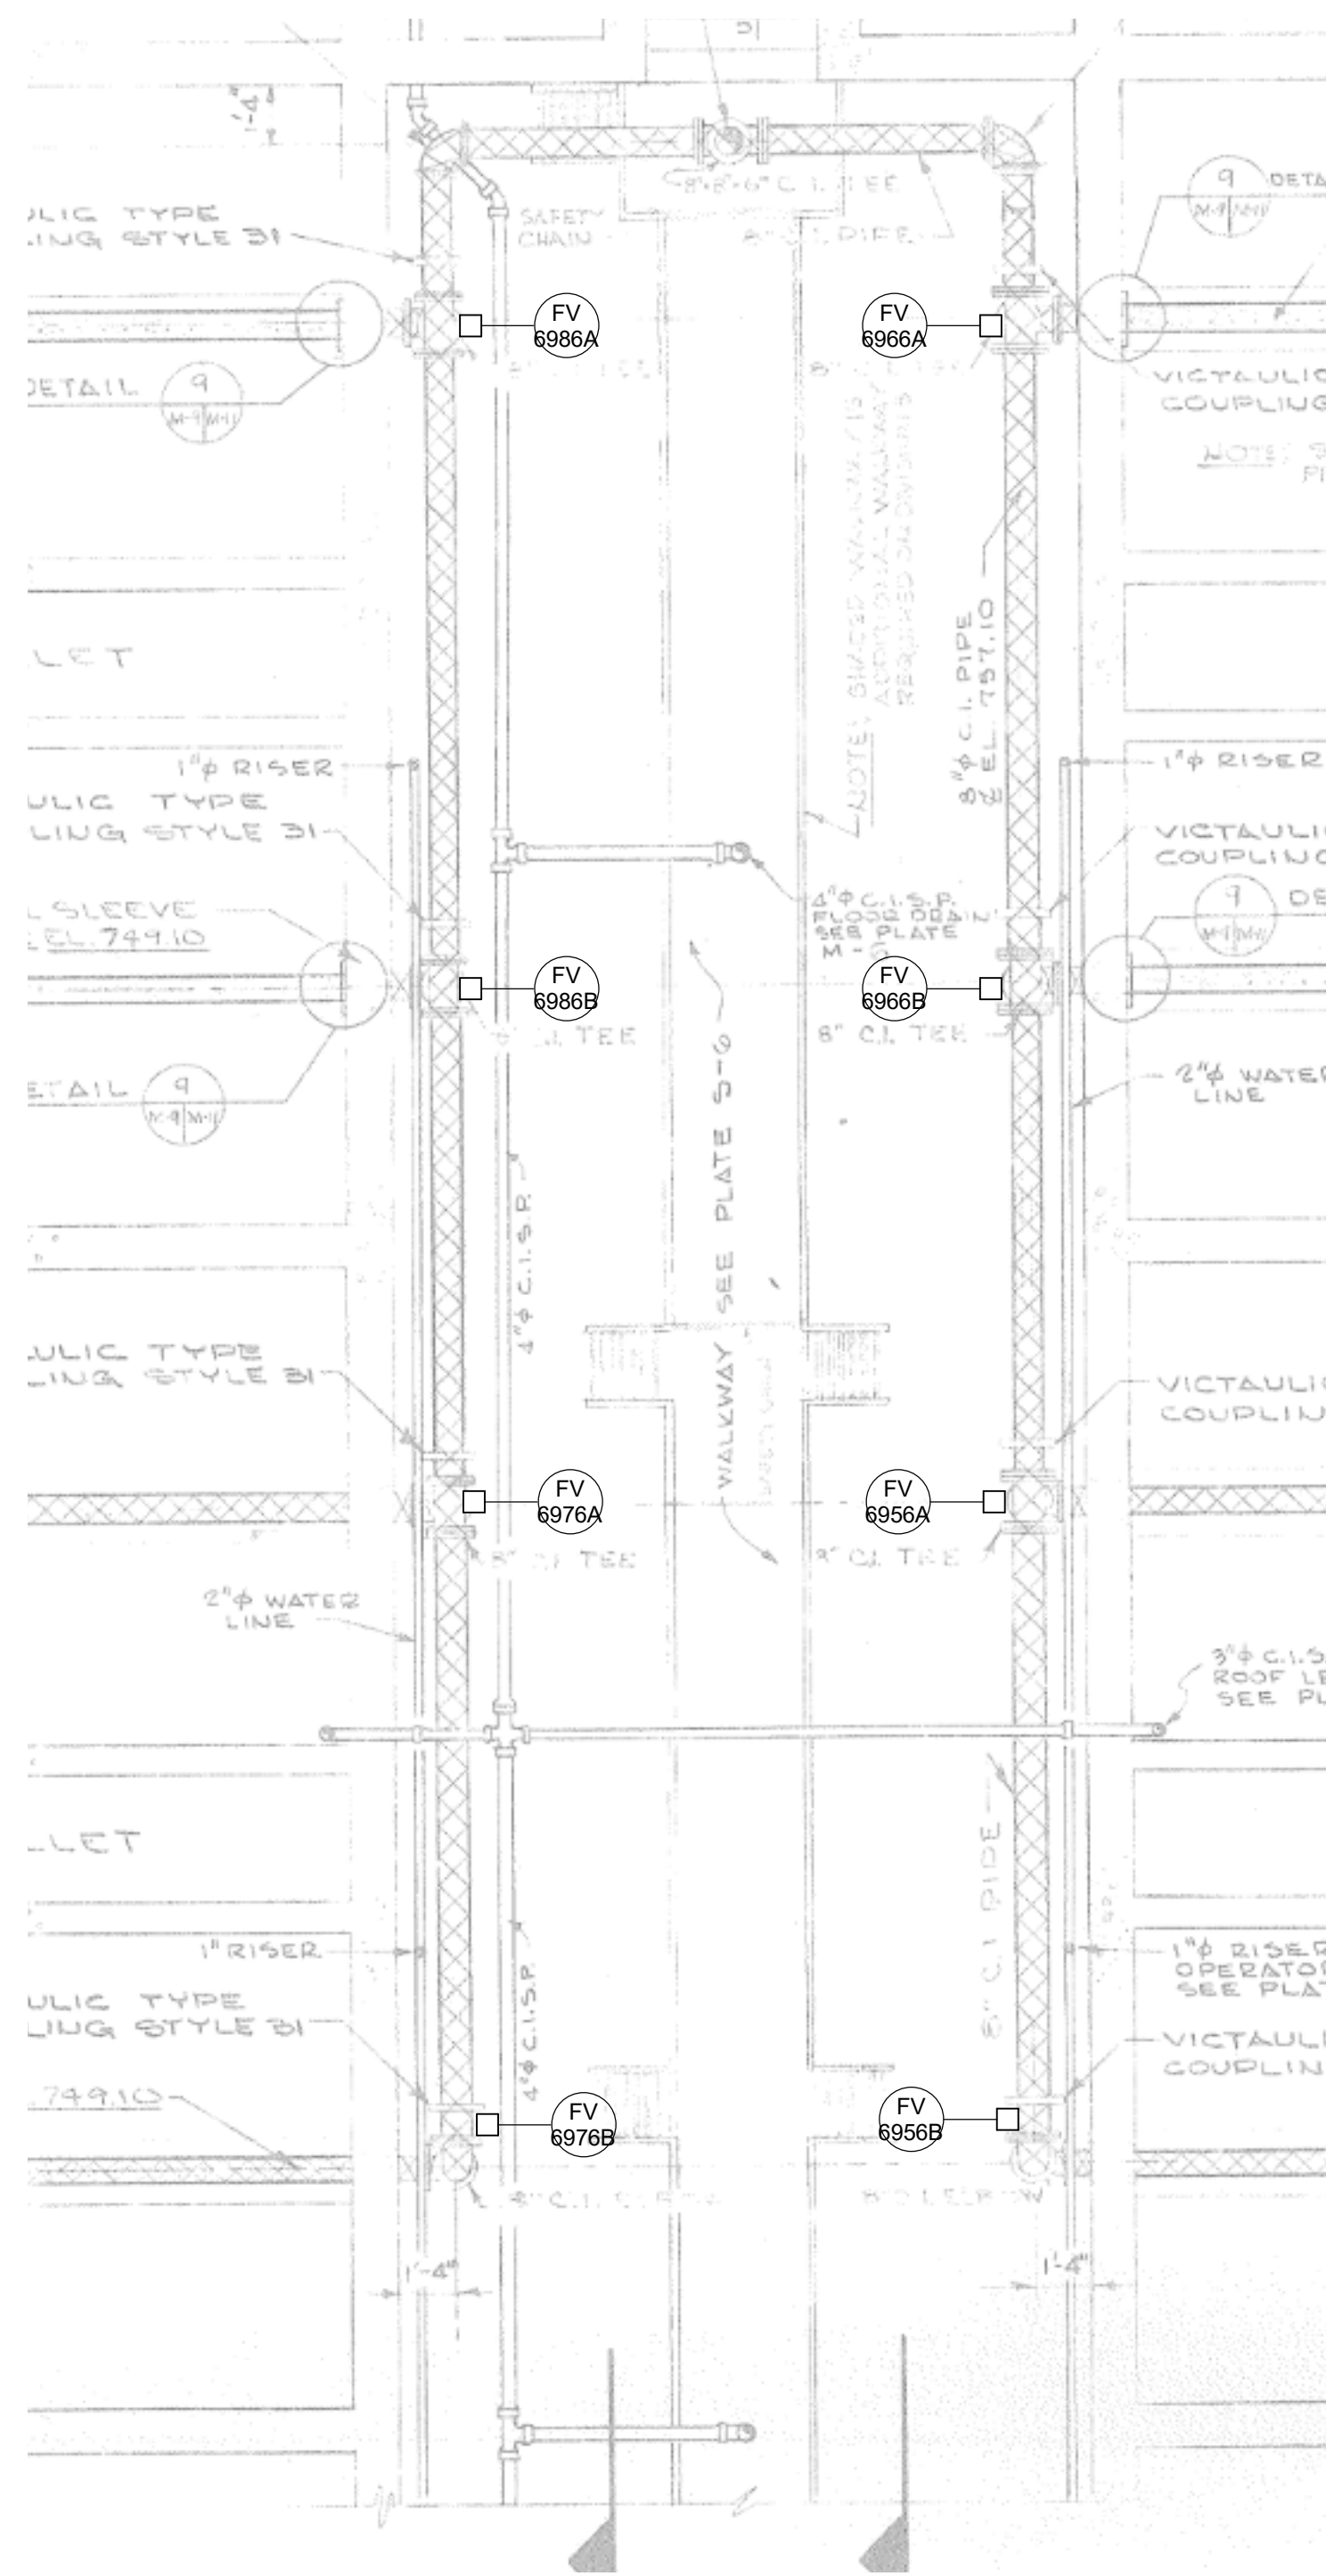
E102 - 1969 BUILDING - PIPE GALLERY - ELECTRICAL PLAN
